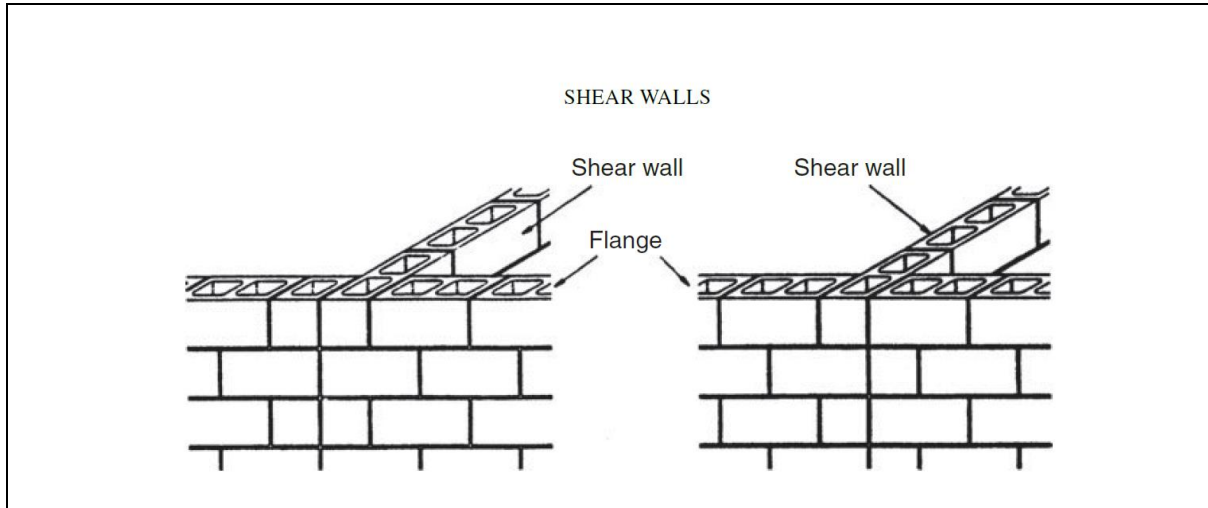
Running-Bond Lap at Intersecting Walls.
